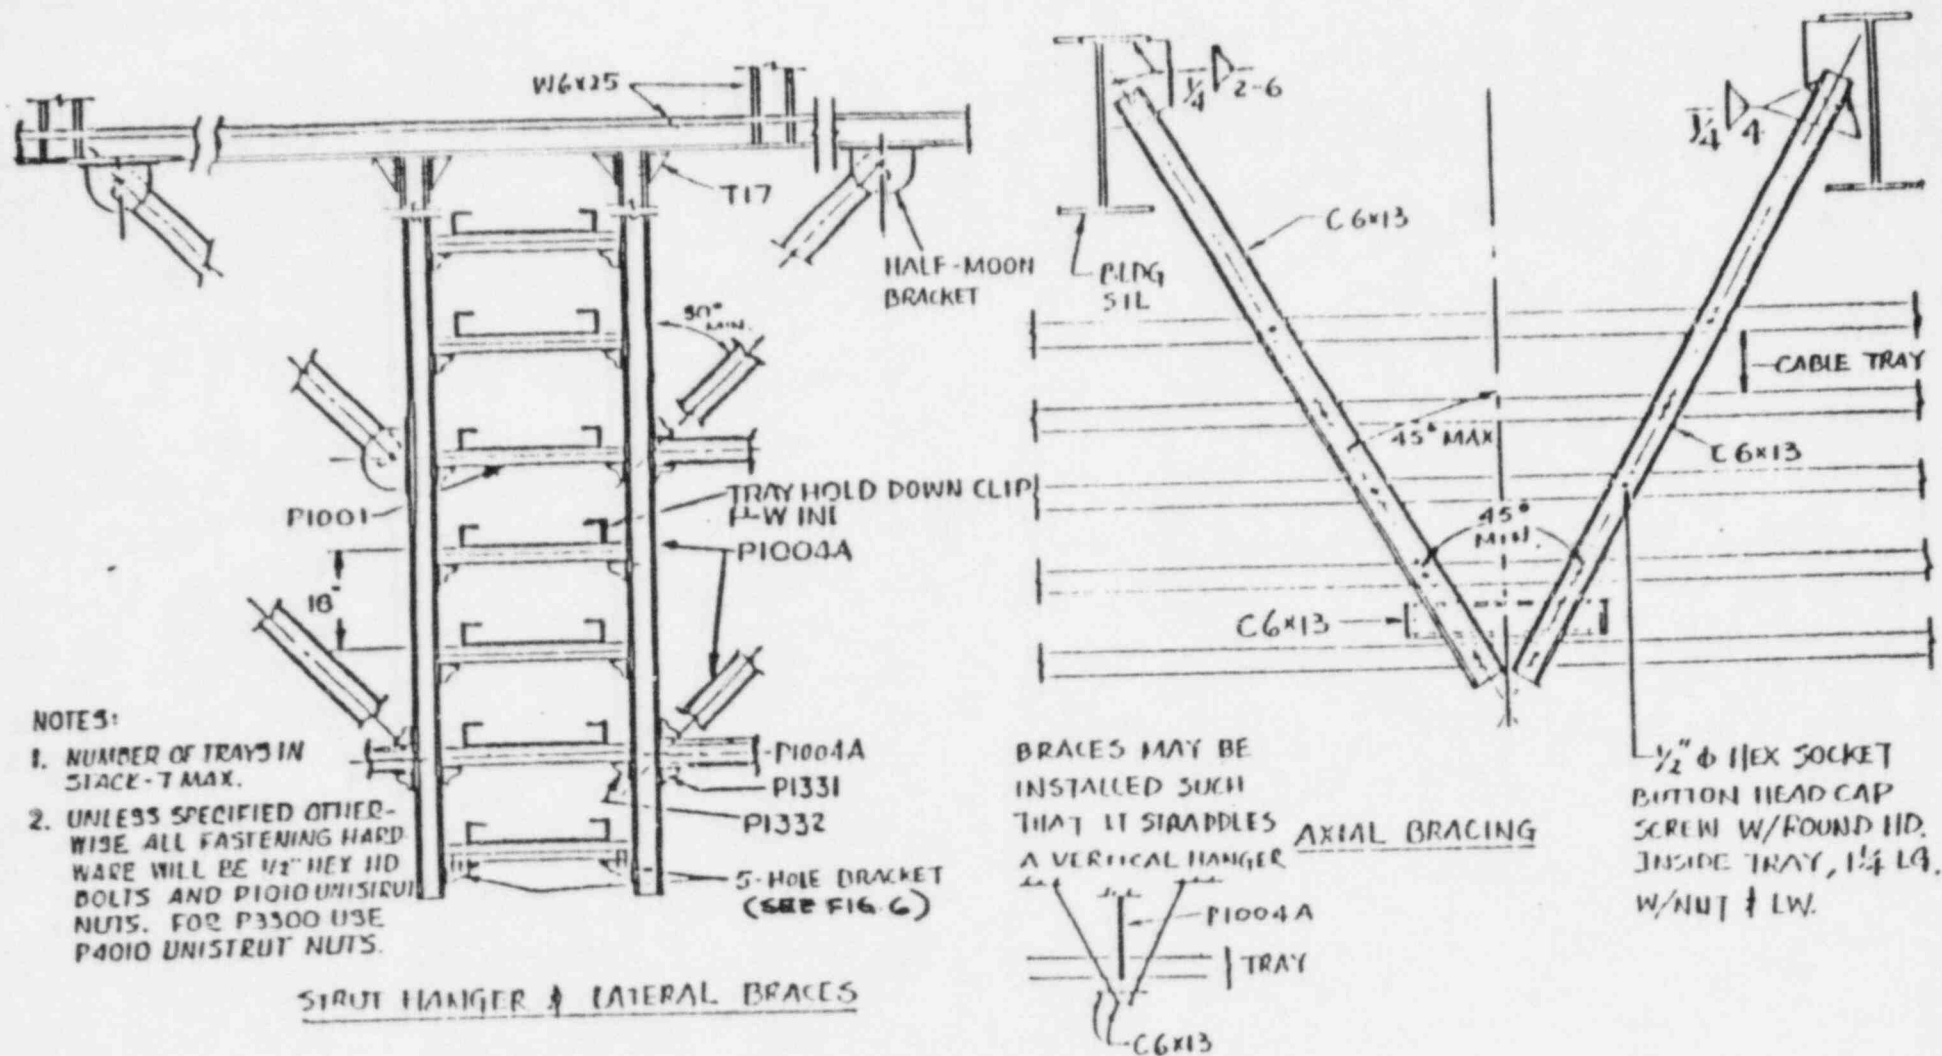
WNP-1 TYPICAL EXISTING STRUT HANGER SUPPORT TYPE
